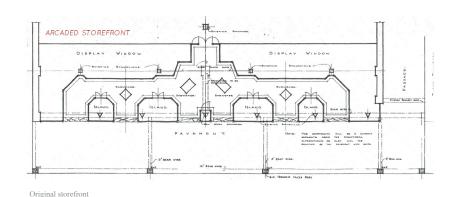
Original building layout and storefront in 1906- not to scale (GAP Architects, 2013 edited by Author)
